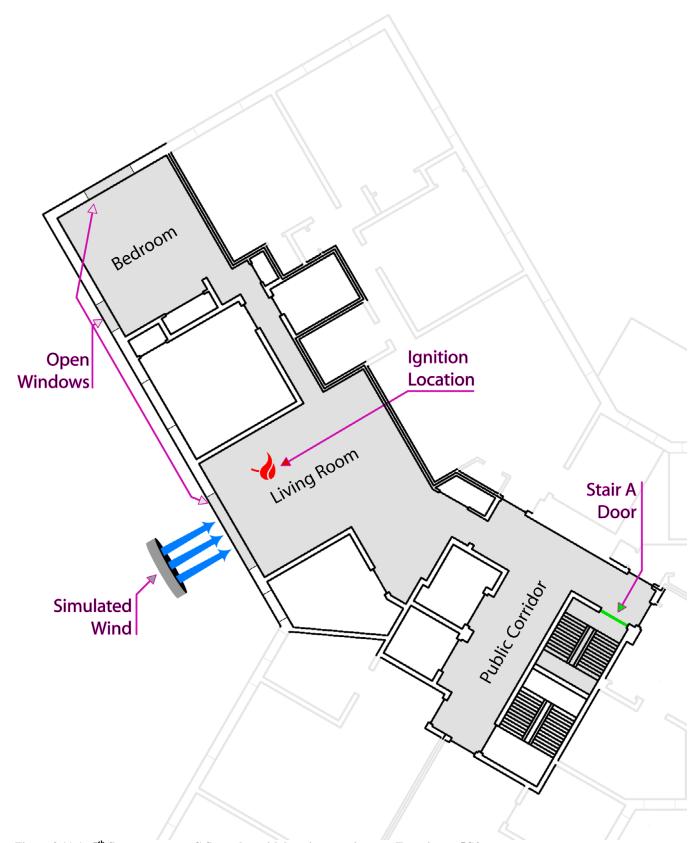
5<sup>th</sup> floor apartment G floor plan with locations pertinent to Experiment 5G2
